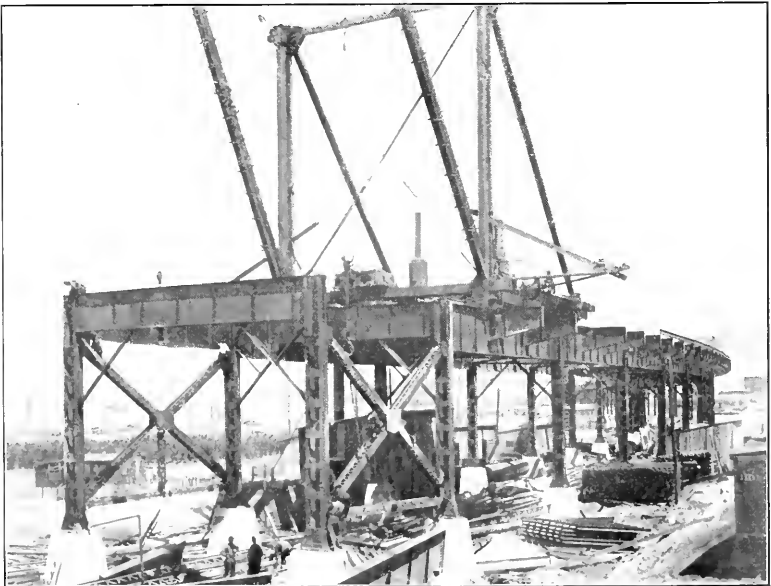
TOWER SPAN, WITH LONGITUDINAL BRACING.
